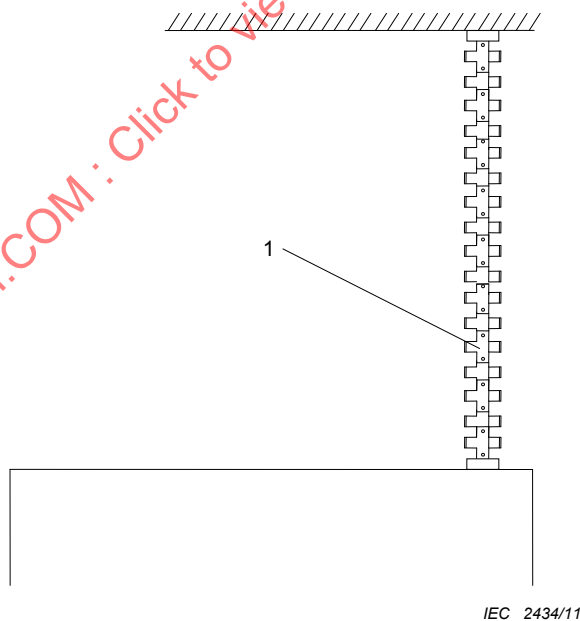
System for cable guiding fed from a cable trunking system or a cable ducting system mounted on the wall
